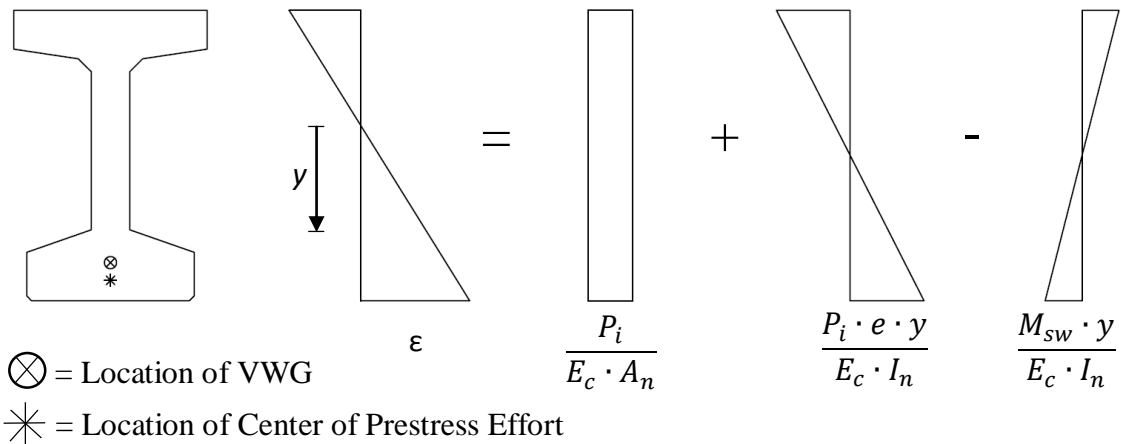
Strain distribution in typical girder section due to initial prestress force.
